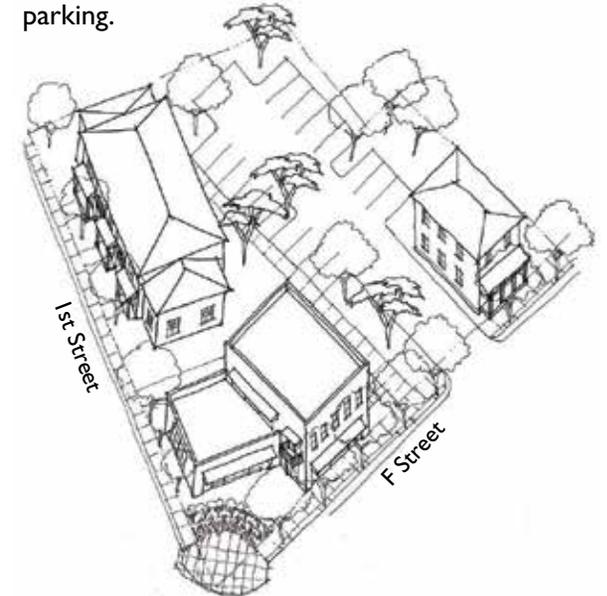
Orient a building toward a plaza to invite pedestrian activity.
